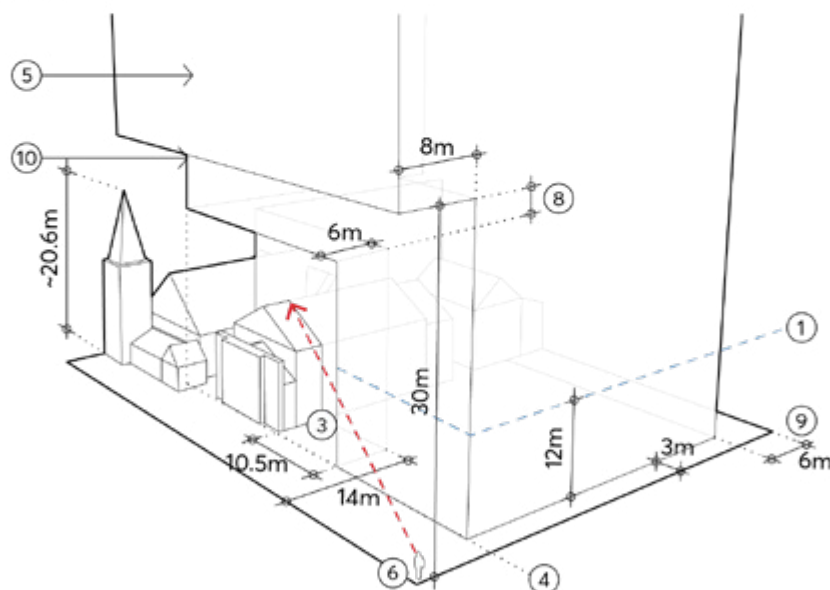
Existing elevations with new building guidelines (Source: TKD Architects with base drawing from Paul Davies)
